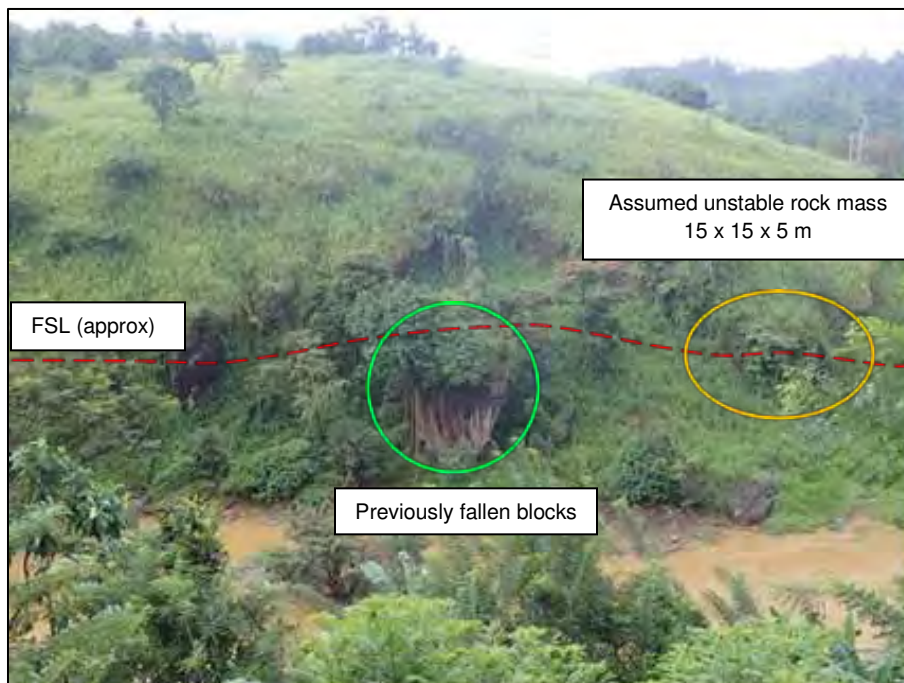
Unstable rock mass on right bank 1.35 km upstream of dam site
